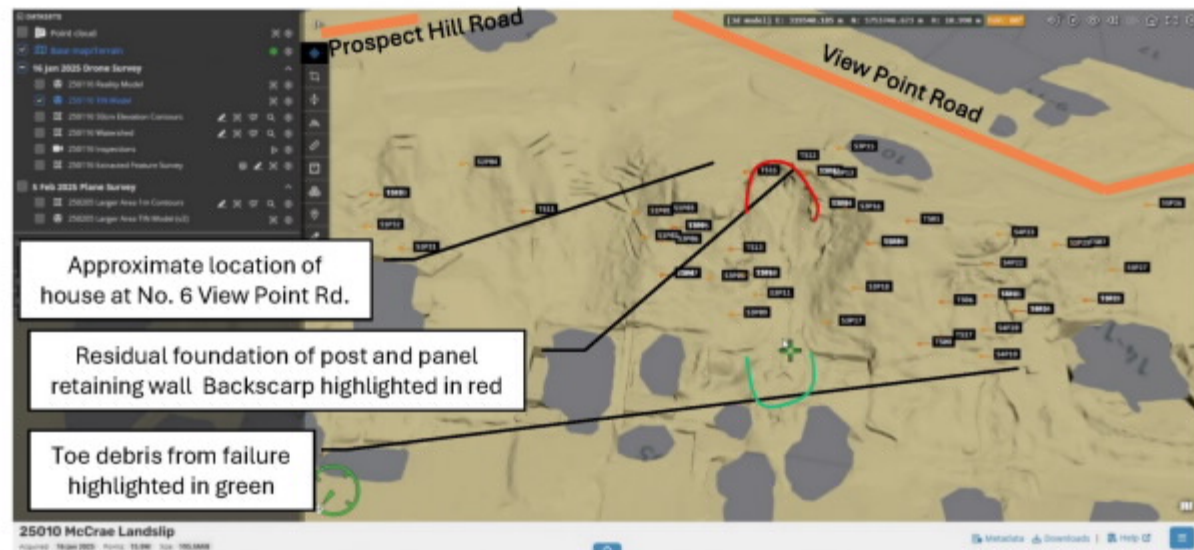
Imagery showing the subject site and adjacent slopes looking south west.
